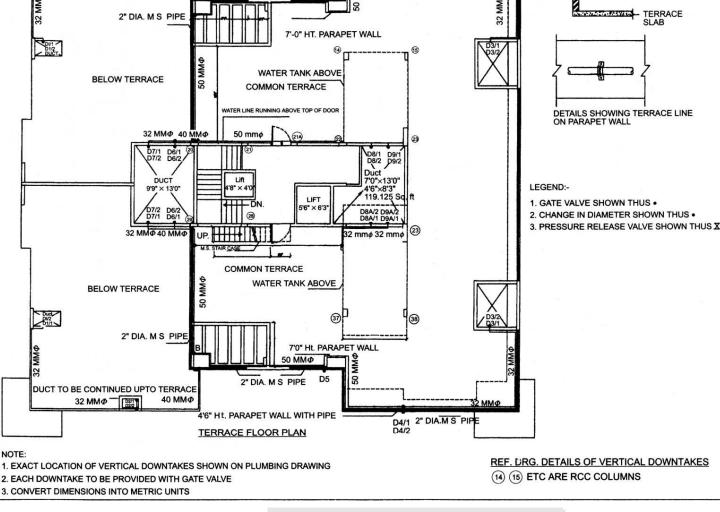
Details – Terrace Floor Plan – Water Line Layout
